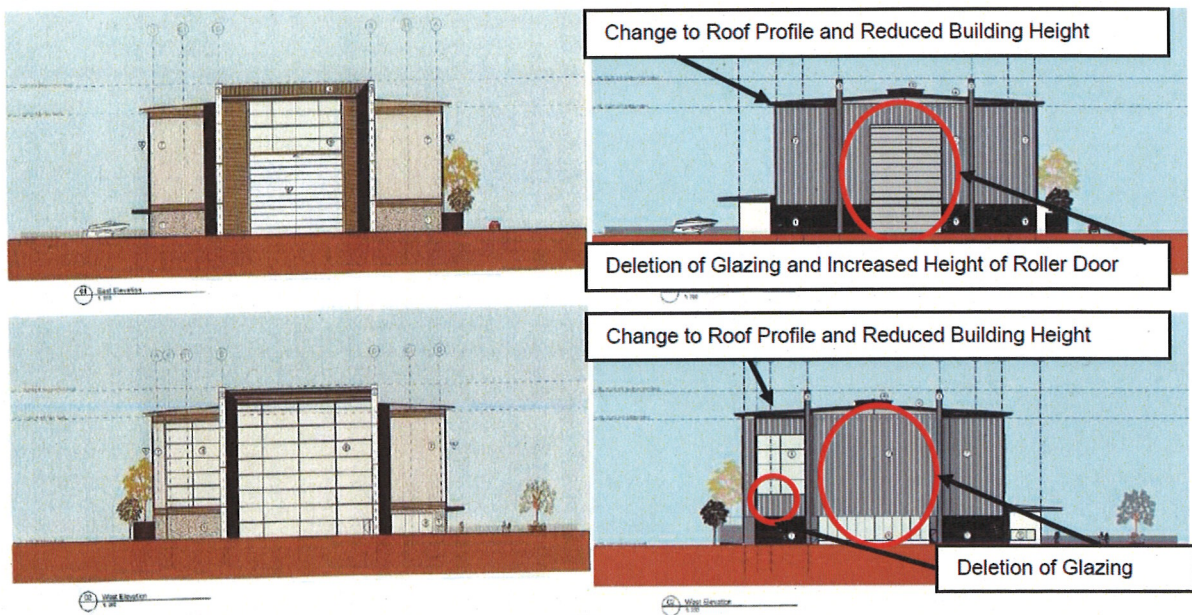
Proposed Modifications to the Northern and Southern Elevations of the Eastern Boat Store
